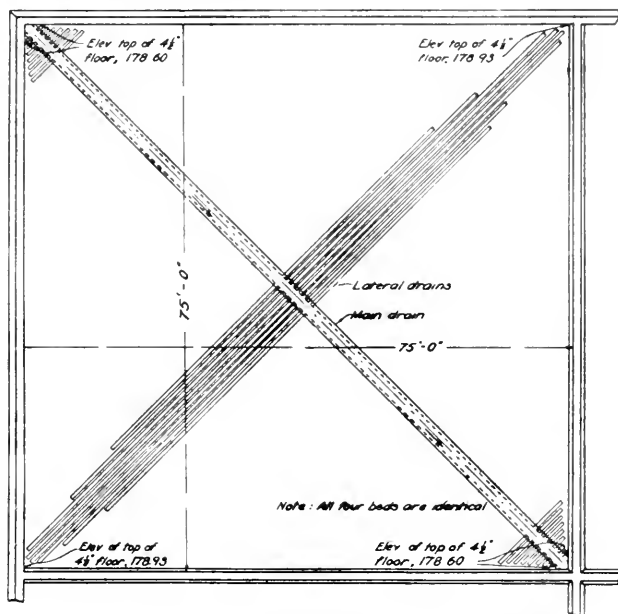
PLAN OF CONTACT FILTER, SHOWING DRAINS.
